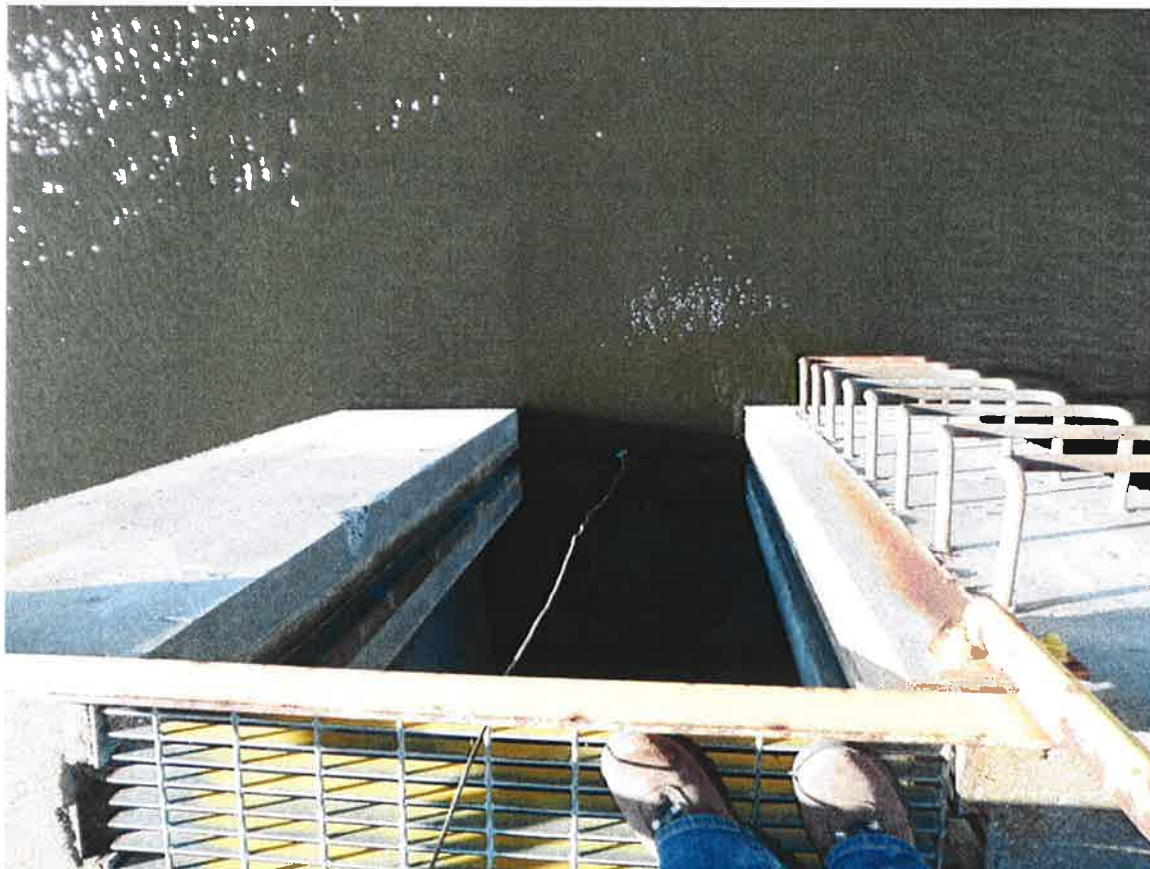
Alternate Bottom Ash Pond – Stop log structure inlet
